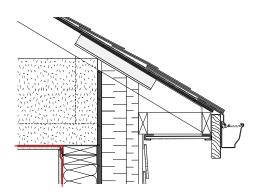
Roof-to-wall interior air barrier redline detail (annotations not shown).
